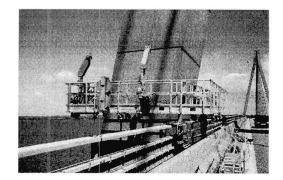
Access equipment, Bucket snooper boom and Skyclimber platform
